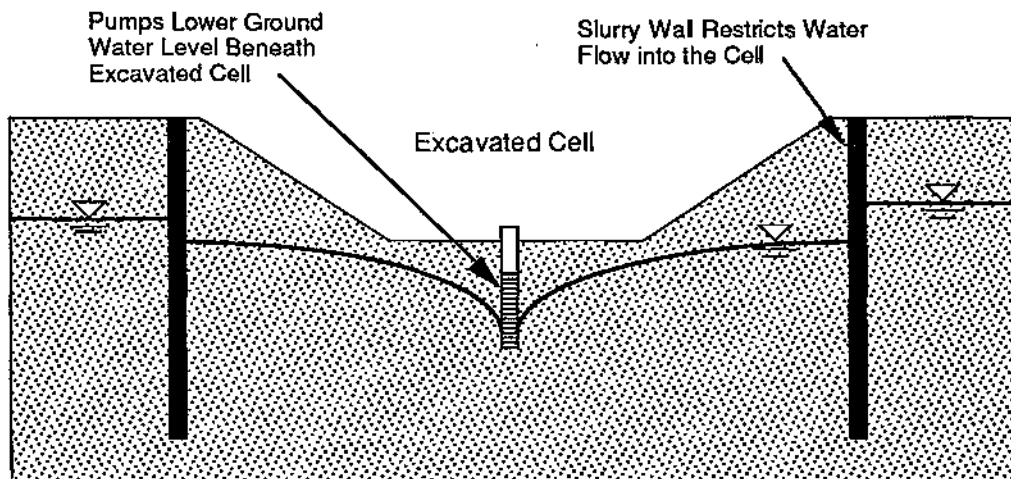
Example of Vertical Cutoff Wall to Limit Flow of Ground Water into Excavation.
